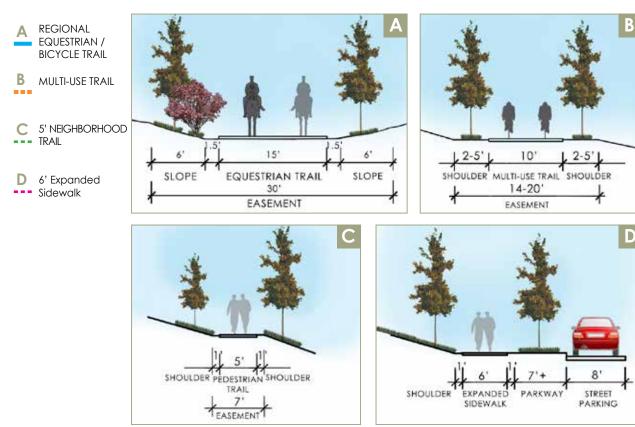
TRAIL CIRCULATION PLAN AND TRAIL SECTION
